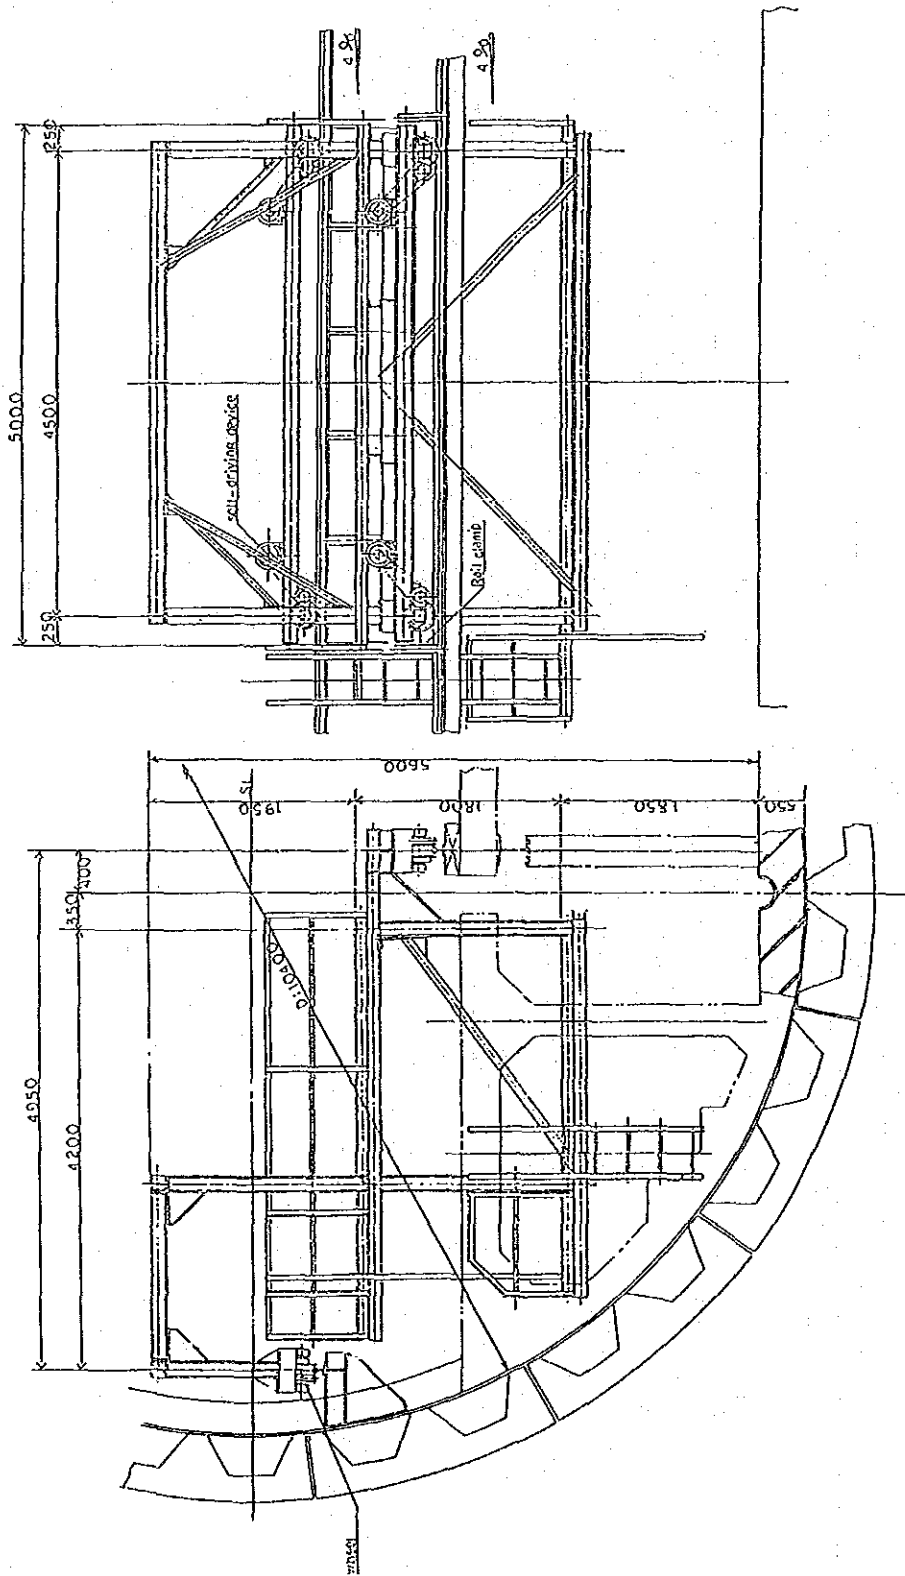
Scaffolding Wheels for Waterproofing Sheet Installation
